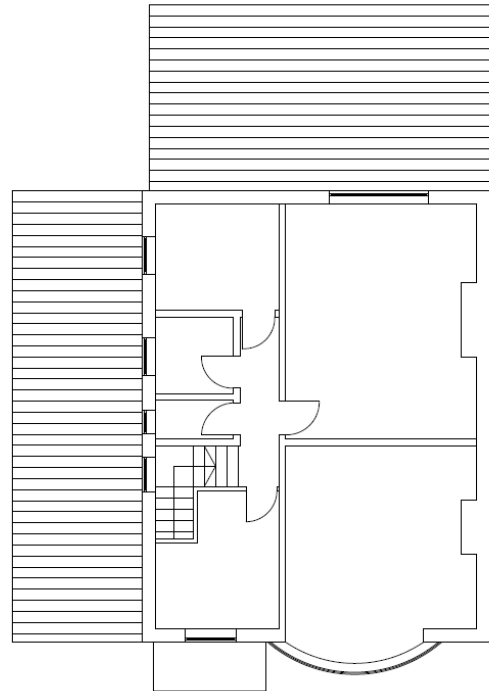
Shared boundary with No.181 Withington Road and No.2 Demesne Road.
